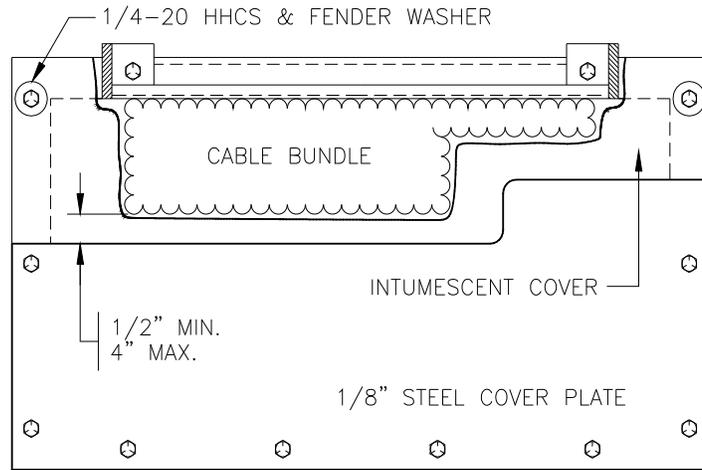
A – PARTITIONING CABLE SLOT IN FLOOR
